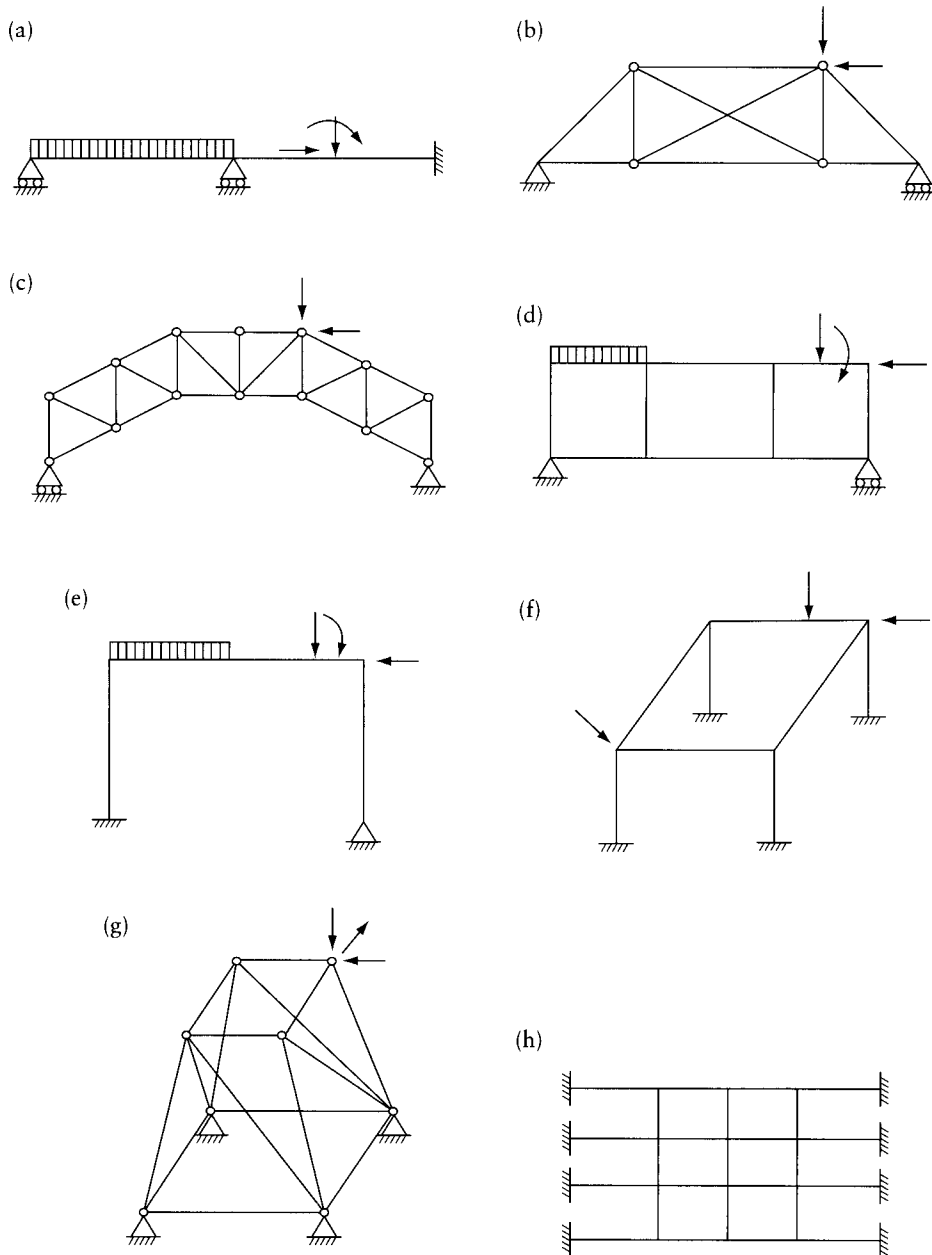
Examples of framed structures. (a) Continuous beam. (b) and (c) Plane trusses. (d) and (e) Plane frames. (f) Space frame. (g) Space truss. (h) Horizontal grid subjected to vertical loads.
